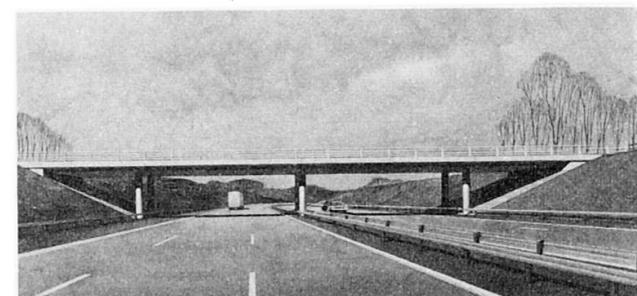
a 4 span overbridge of Reinforced concrete slab deck with individual columns
